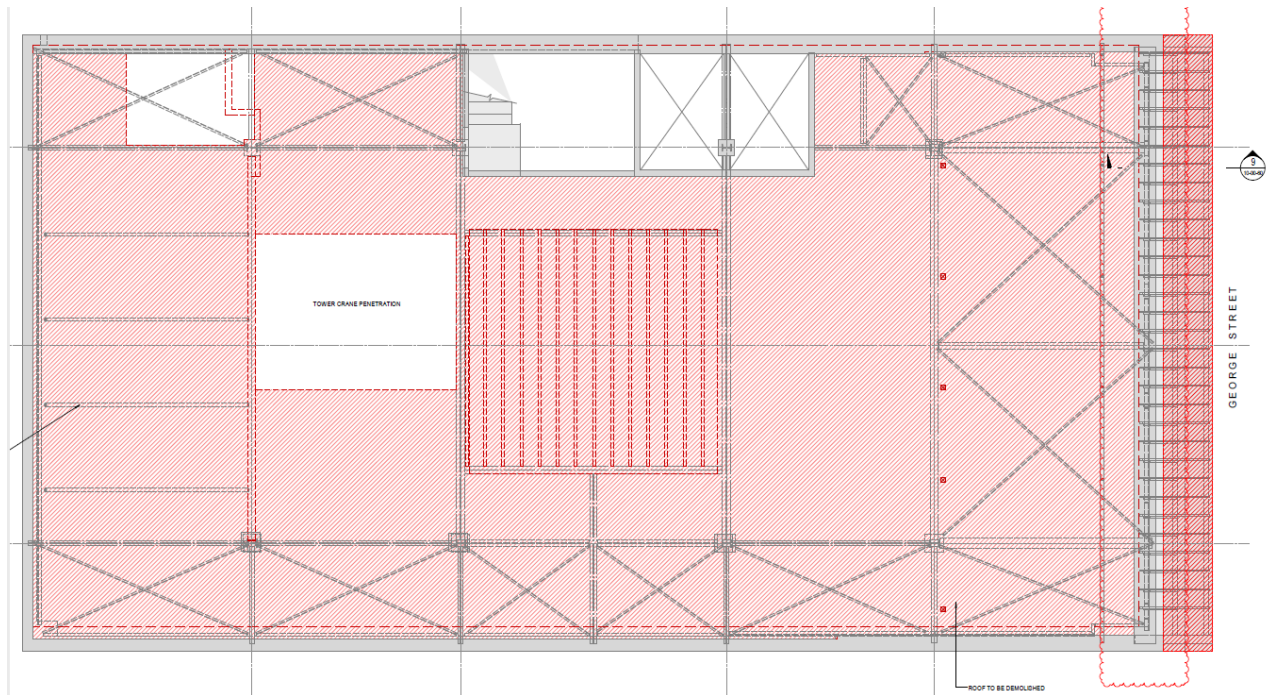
Proposed extent of roof slab demolition, shown in hatched red. (Source: TTW, drawing number ST-285-10-00-50, Rev C 27.03.2019)
